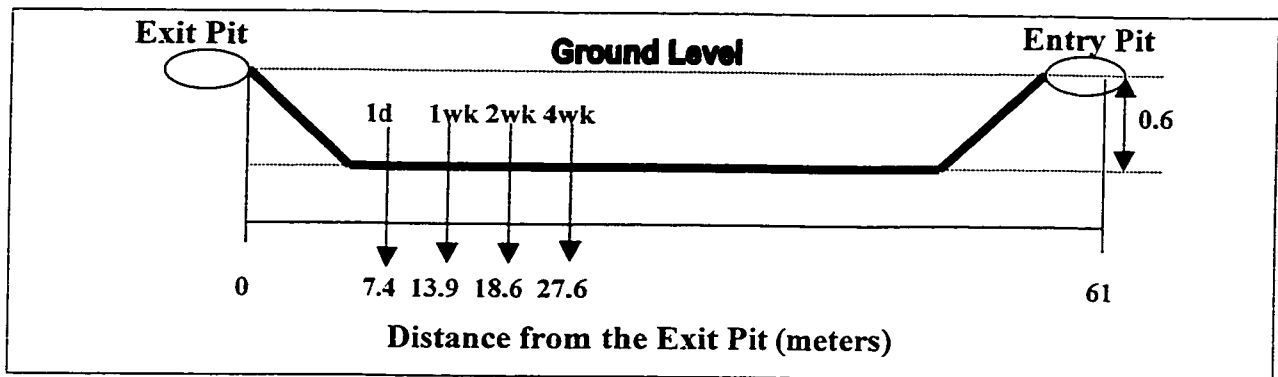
Elevation View of the 100mm Pipe Installation in Sand
